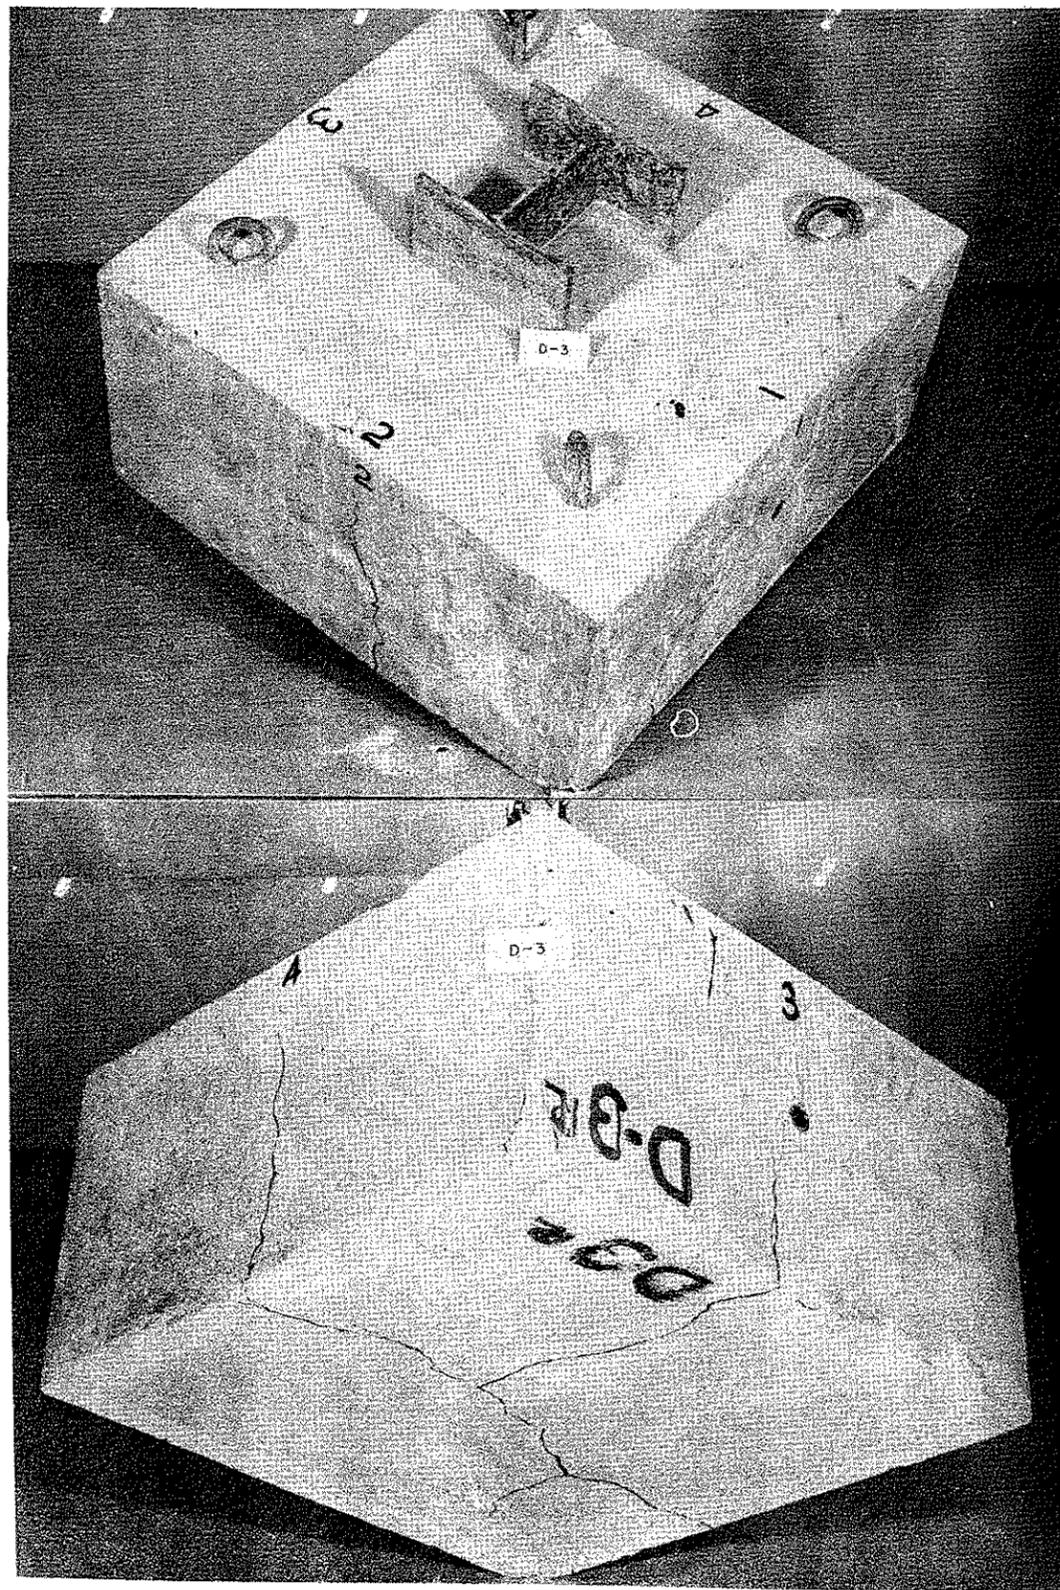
APPEARANCE OF SPECIMEN D-3 AFTER TESTING.
